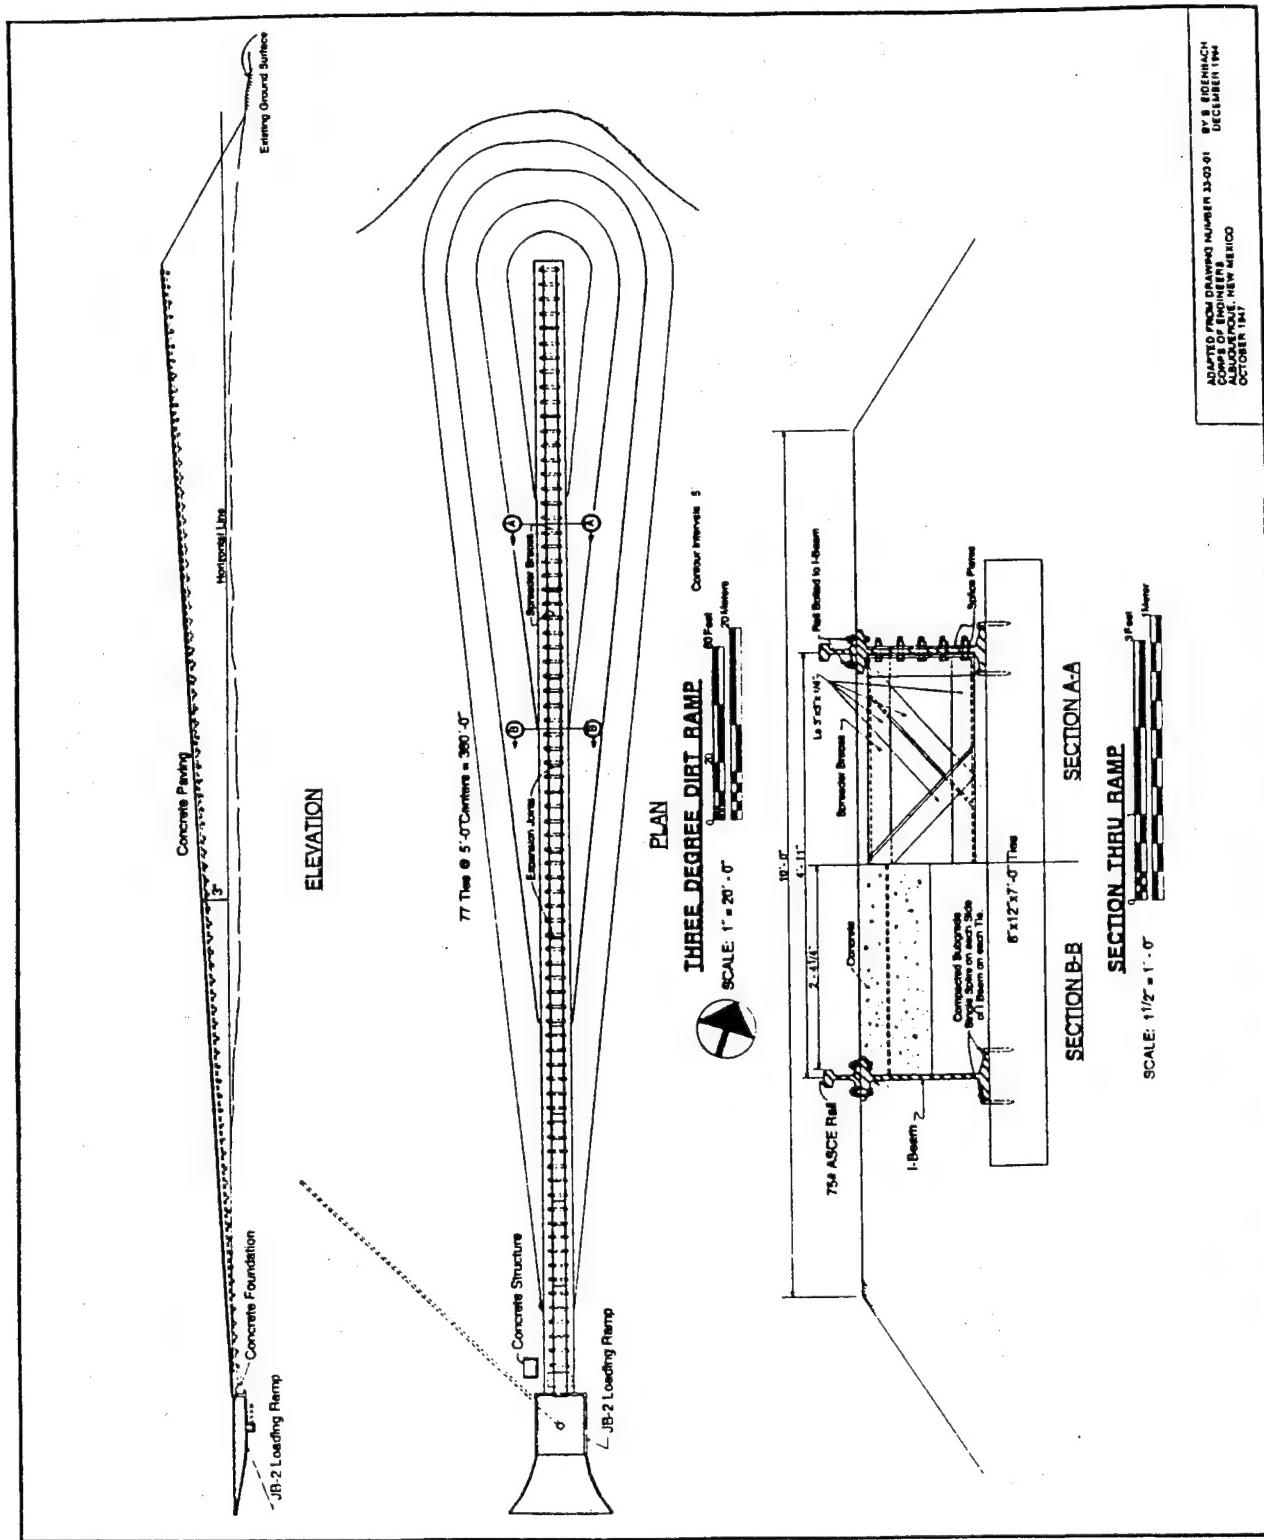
1947 JB-2 launching ramp plan (adapted from U.S. Army Corps of Engineers drawing by Eidenbach and Wessel 1995).
